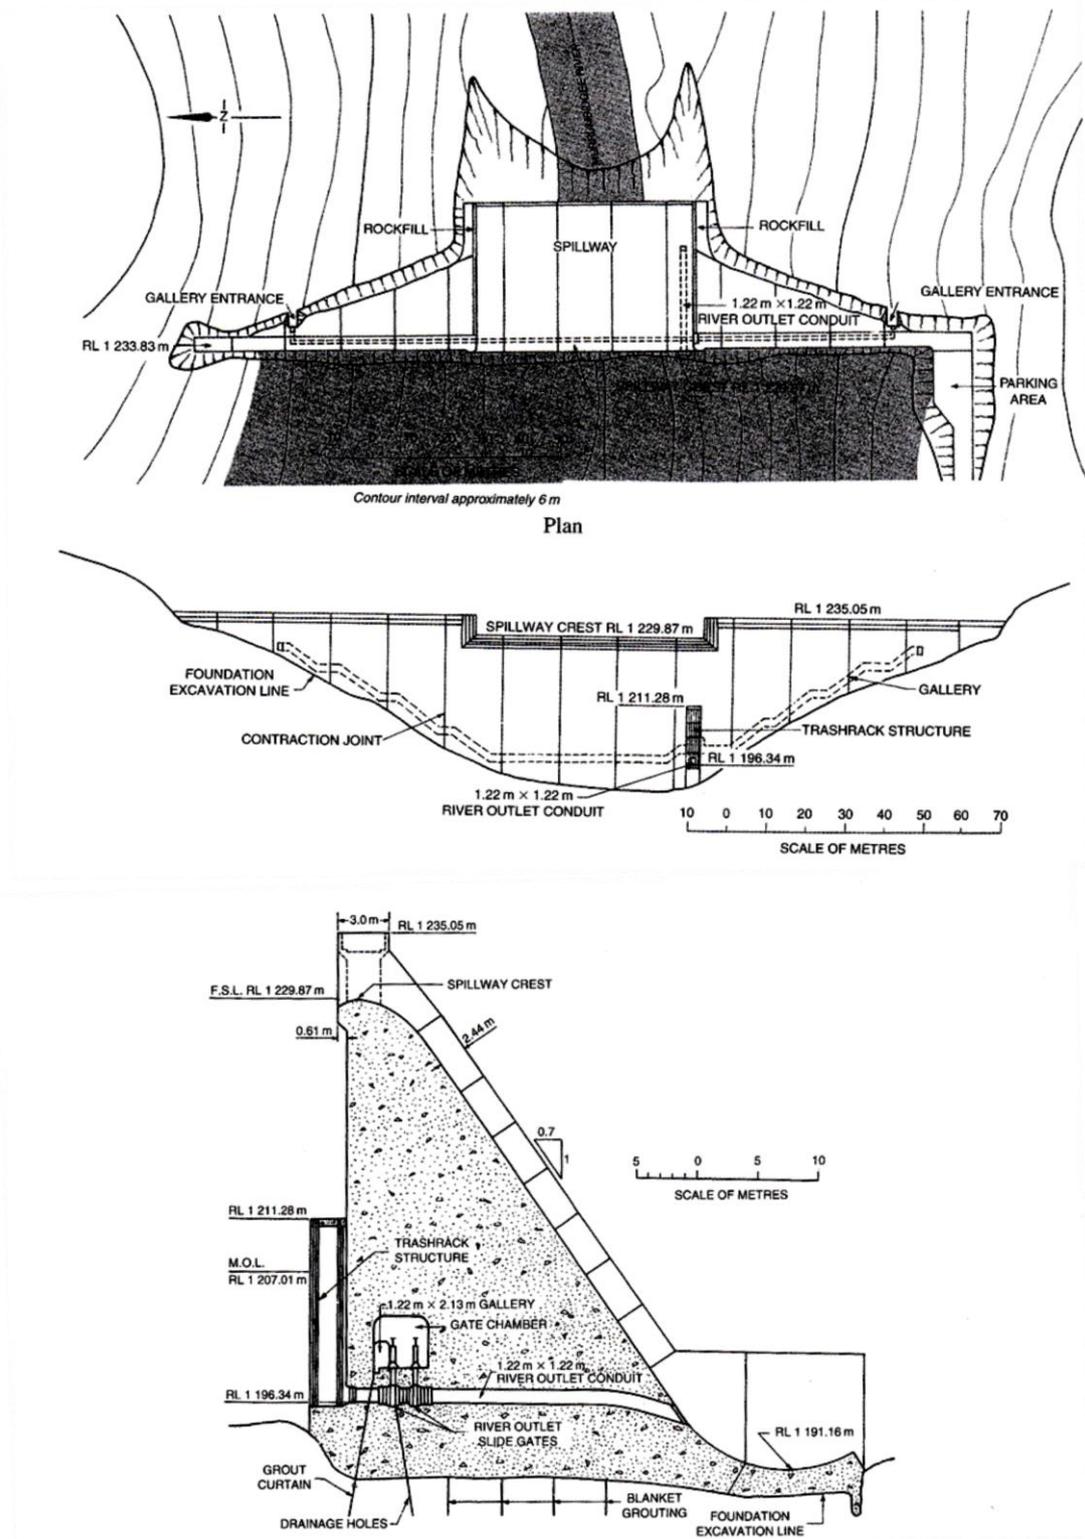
Typical concrete gravity dam plan (Fell et al., 2015)
